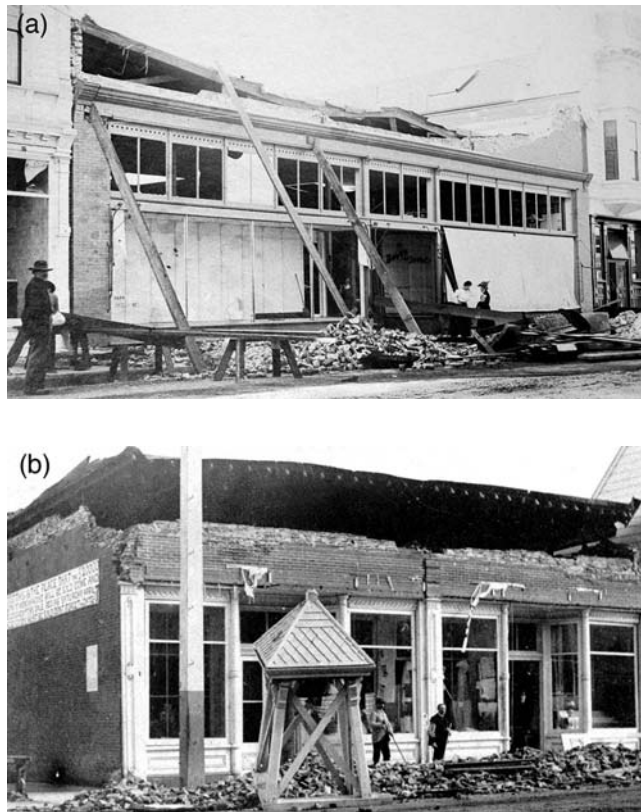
Damage to brick buildings in Ferndale. (a) The General Mercantile on 339 Main Street suffered collapse of the parapet wall, and every window was broken. The building was repaired and then damaged again in the 1992 Cape Mendocino earthquake (see Fig. 9). (b) J. Gollober store. The cupola housed the fire bell and was thrown to the ground. The building was demolished. Photos by E. Garrett, courtesy Peter Palmquist.
